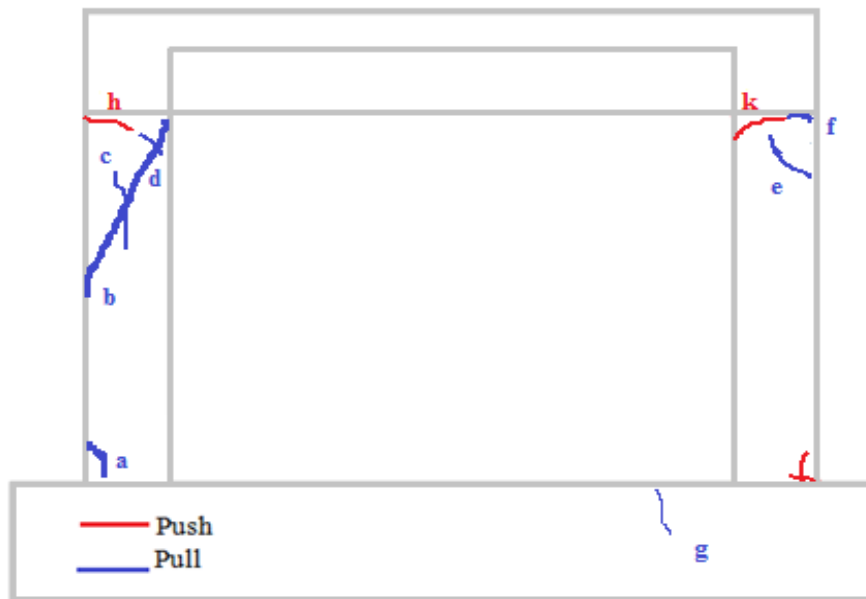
Crack scheme of RCF-2 specimen at the end of the test
